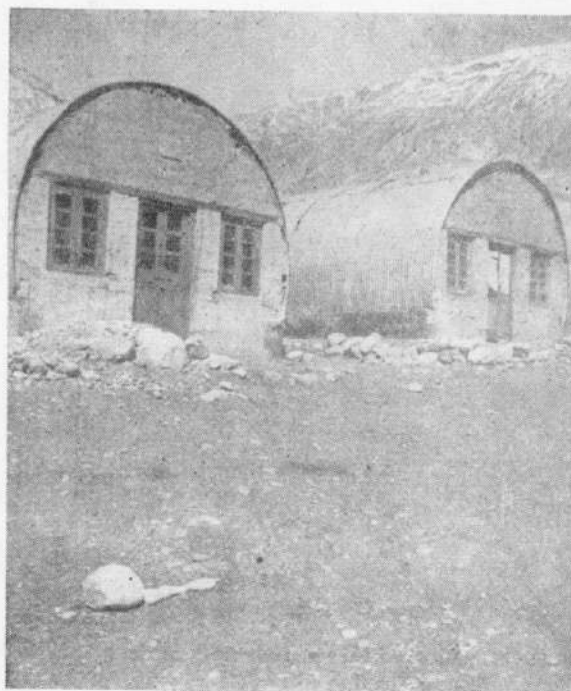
Cylindrical sheds of corrugated iron sheets which suffered no damage except development of cracks on the side walls near Sumdoh village.
